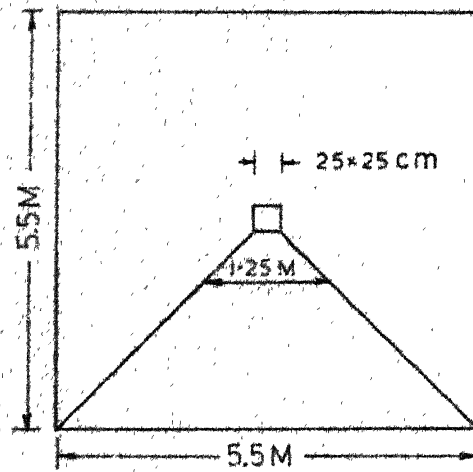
FOUNDATION PLAN OF ILLUSTRATED EXAMPLE.
